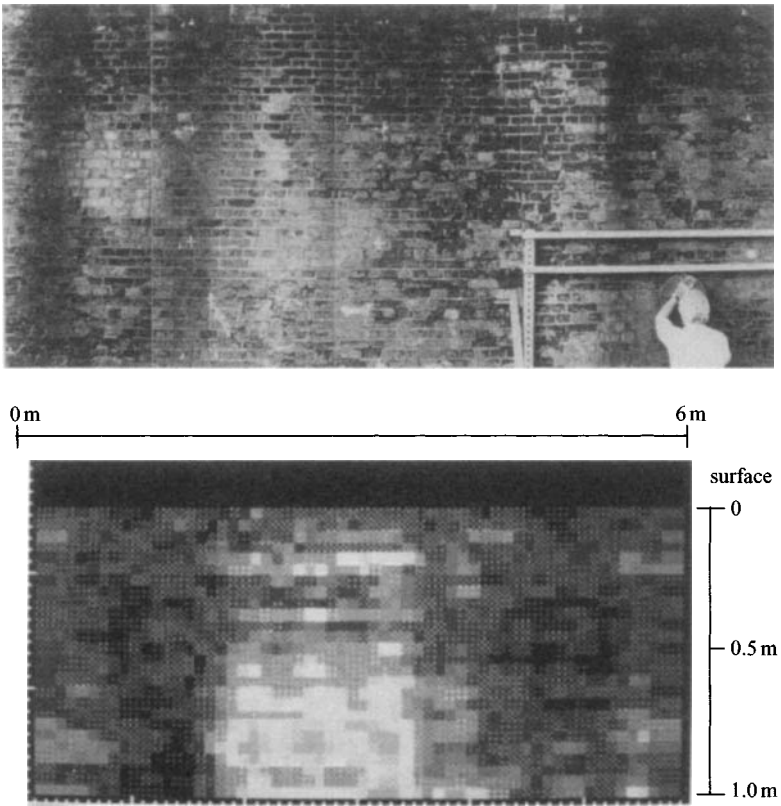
Radar survey of bridge abutment (courtesy British Rail)
